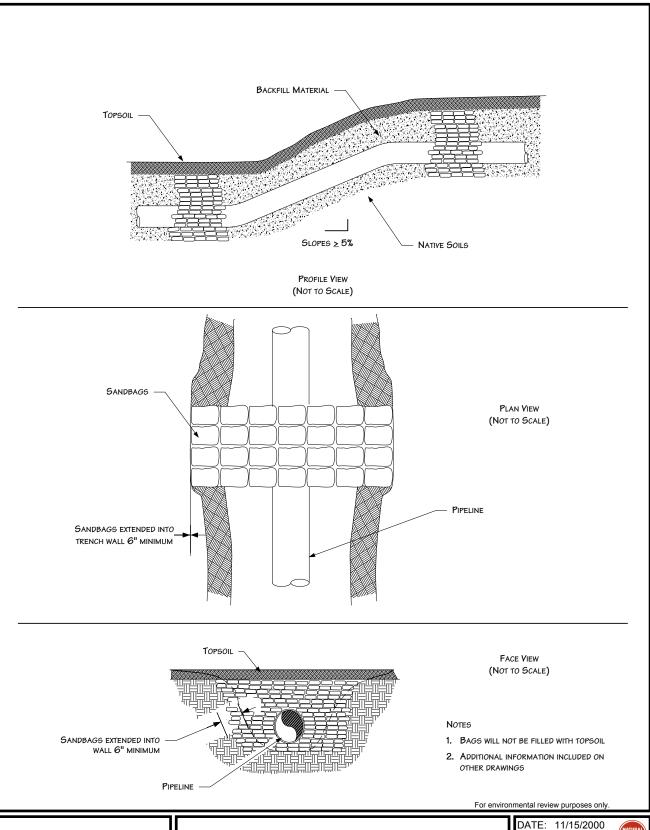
Environmental Protection Plan Typical Trench Breakers – Plan & Profile View
